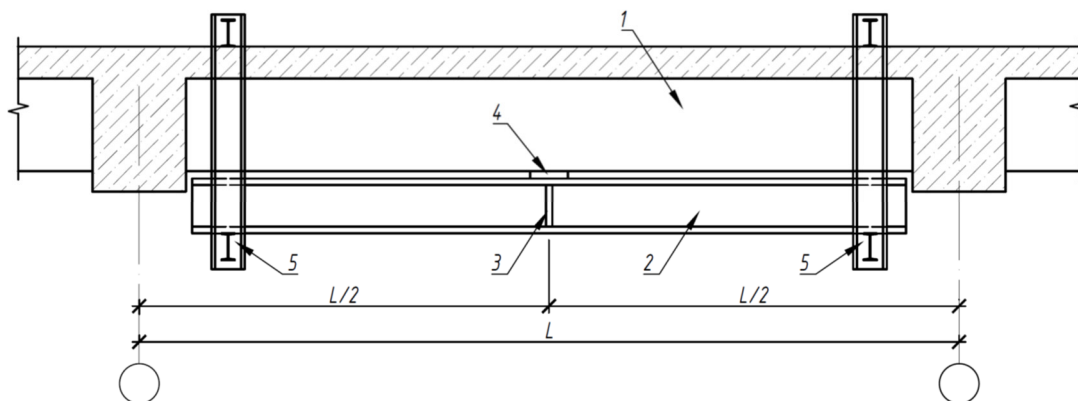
Strengthening of the reinforced concrete beam of the monolithic floor slab with the prestressed steel beam on the clamps
